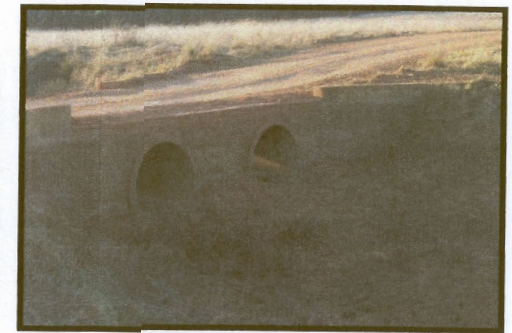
Dirt road with sedimentation deposited upstream of the culvert.
